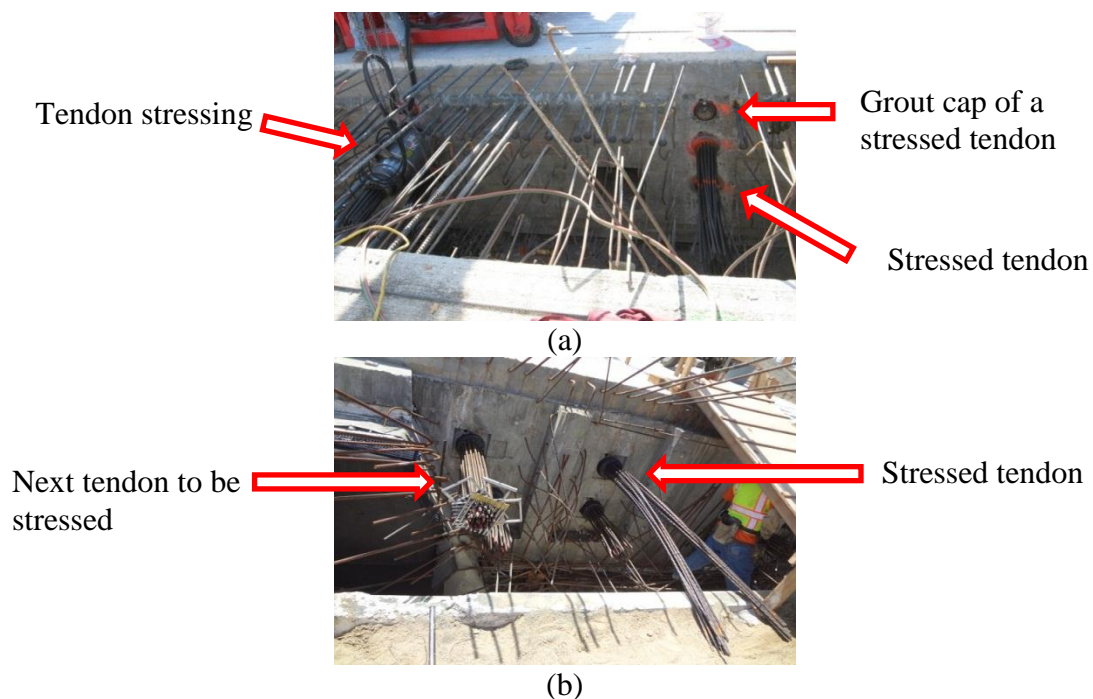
Stressing sequence at: (a) Hinge 7, Bridge 1; (b) Abutment 9, Bridge 4
